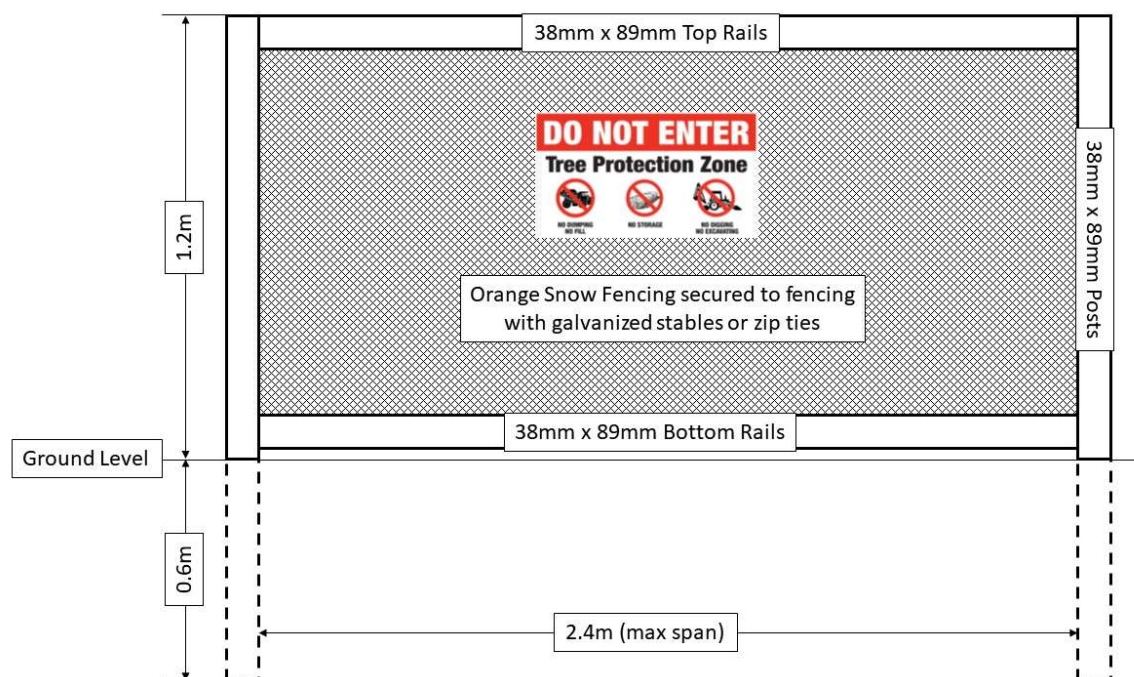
Tree Protection Fencing. In rocky areas, metal (t-posts or rebar) drilled into rock will be accepted instead of wooden posts.
